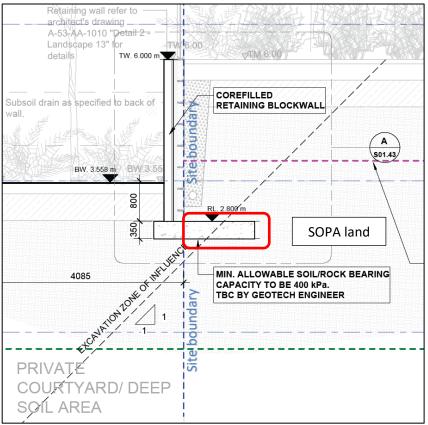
Section showing the foundation under SOPA land in red (Source: S01.43, Retaining Wall Details, prepared by Smart Structures Australia, dated 29 April 2025)
